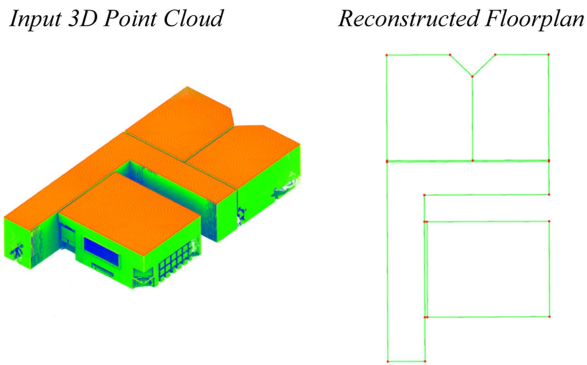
Indoor floorplan reconstruction: KELSE extracts structural elements from the given indoor scene point cloud, converts them into a KDS, and performs kinetic expansion to reconstruct the indoor floorplan.
